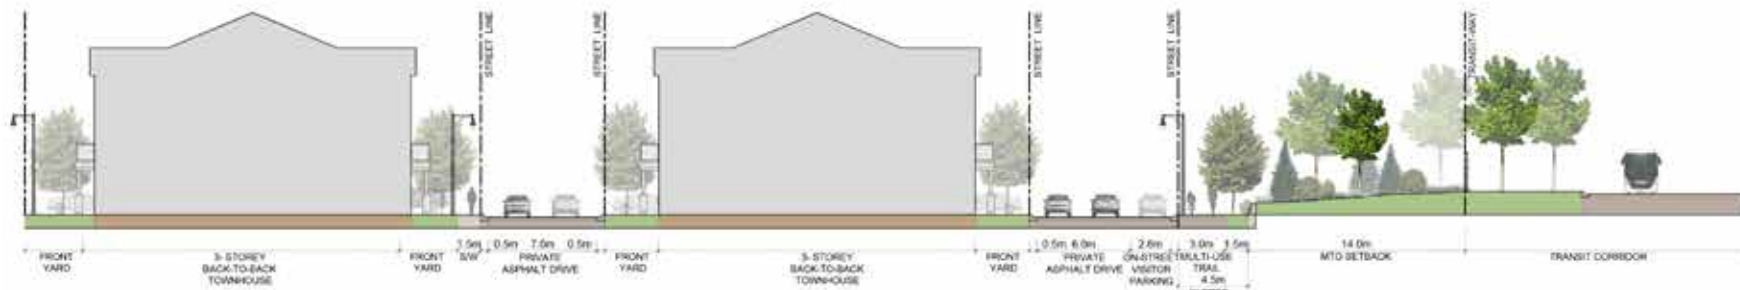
Section D: 7m private road interface with buffer and Transitway corrido
